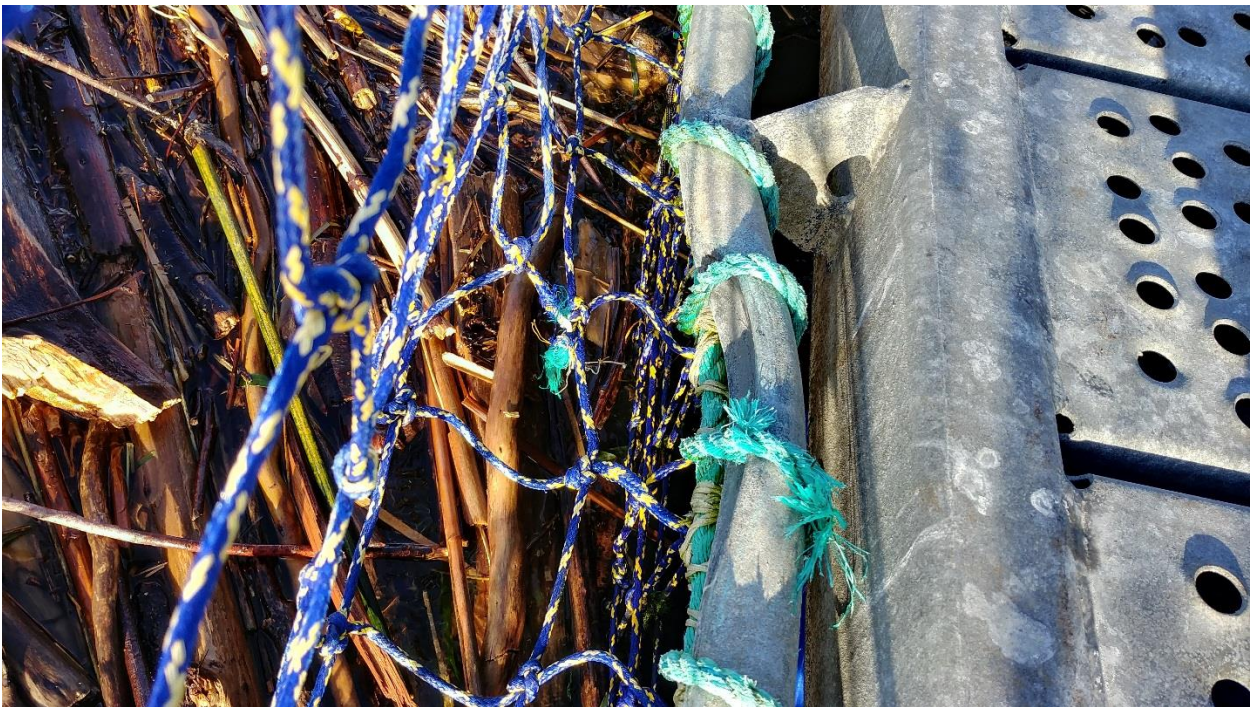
Damaged Predator Net Railing, West Side of-Facility
